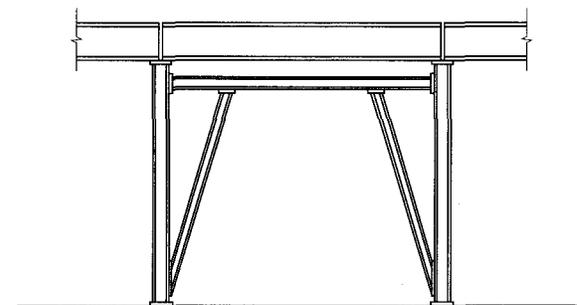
Modified Portal Crane Runway Bracing
